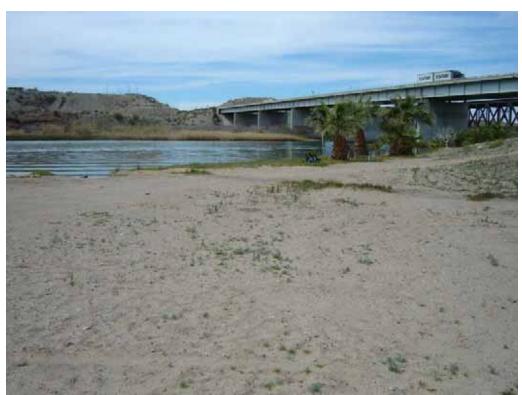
Pre-Construction: Viewing northwest at the AB-2 (MW-56) work area located south of the I-40 bridge.
